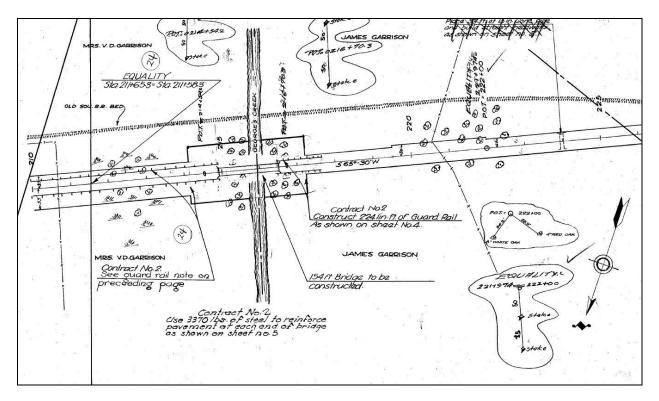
Portion of 1929 road plans showing "Old Sou. R.R. Bed" (north is pointing down).
